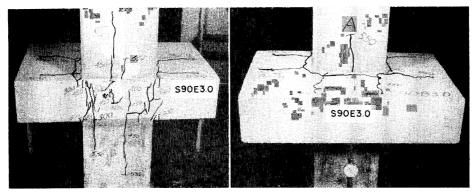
Typical cracking for edge column specimens, Type E (slab series)
